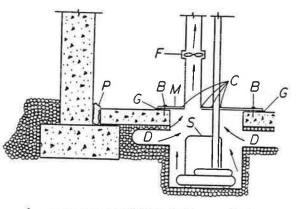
</sup>. Sub-slab ventilation using an existing sump and sub-slab drainpipes. If the sump-pump is not submersible it is replaced by one (S). A negative pressure with respect to the basement (and the outside) is induced in the sub-slab by a fan (F) in a PCV pipe drawing radon from the sump and subslab via the drain pipes (D) to the outside. The plywood cover (M) is made removable by bolts (B). Gaskets (G) around the perimeter of the cover and caulking (C) at the PCV pipe and the sump pipe ensure air tightness. Also openings (P) from the sub-slab to the basement, are sealed with polyuretheme foam to avoid short-circuiting of air directly from the basement to the outside.
